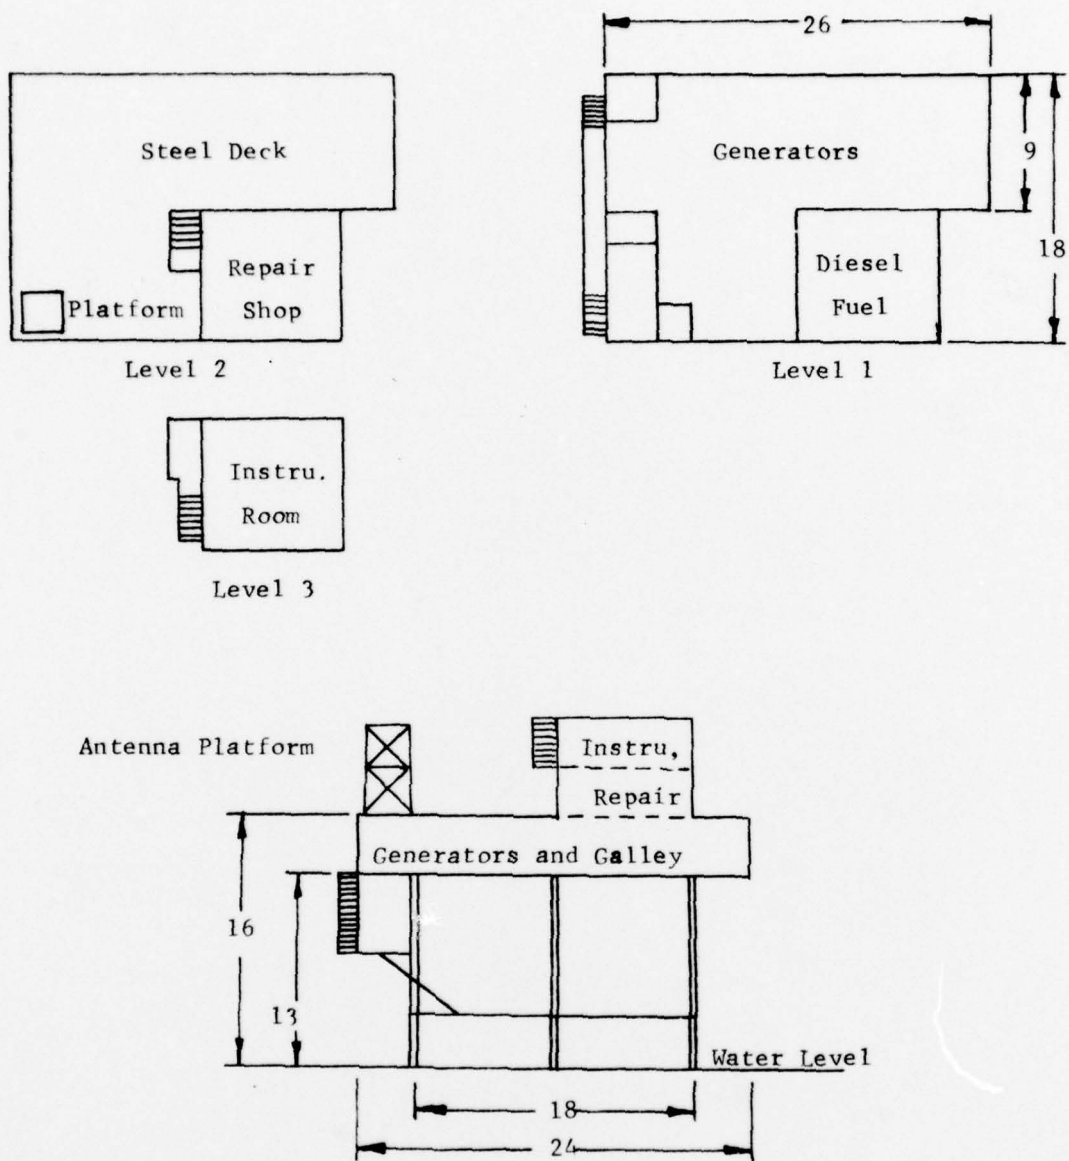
Stage II Research Tower Facility Layout (Dimensions in Meters).
